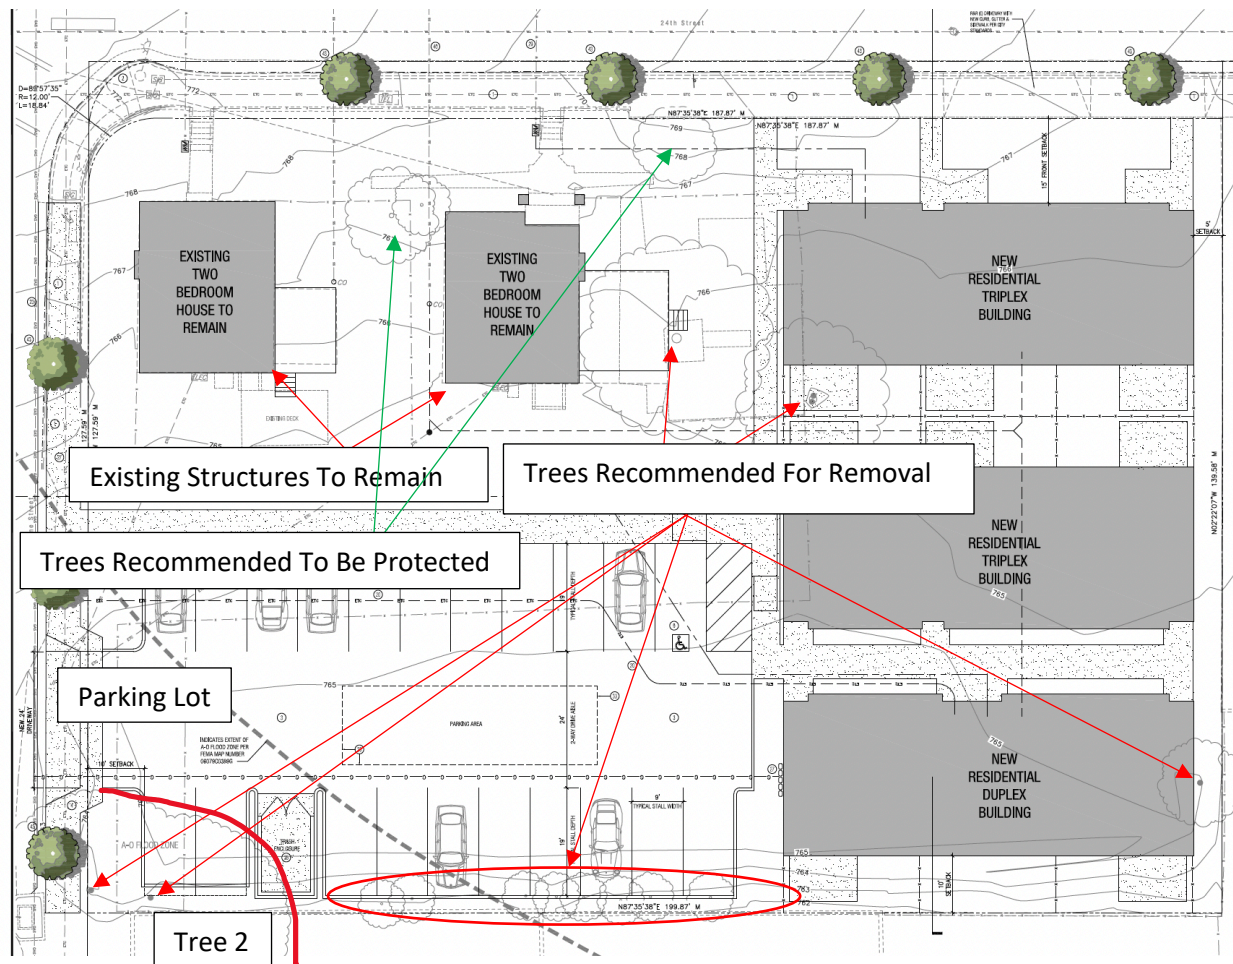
site plan marked up to show property lines, proposed structures, and proposed parking lot area.
